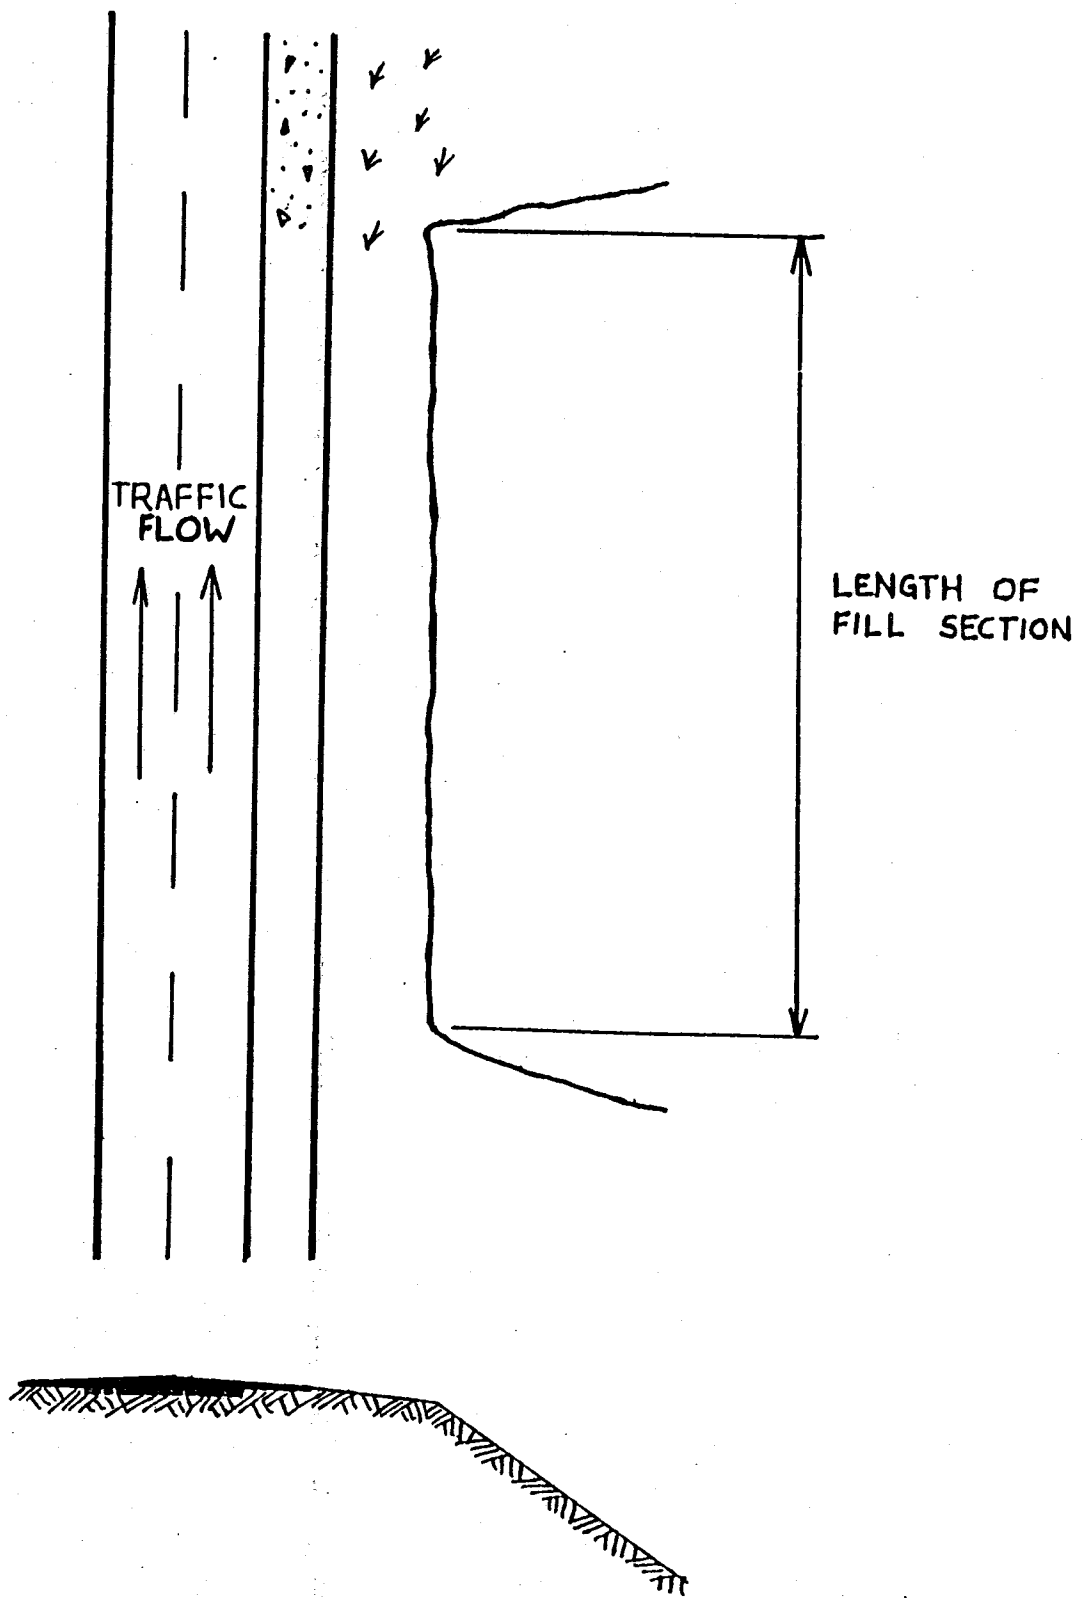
TYPICAL BARN ROOF FILL SECTION
